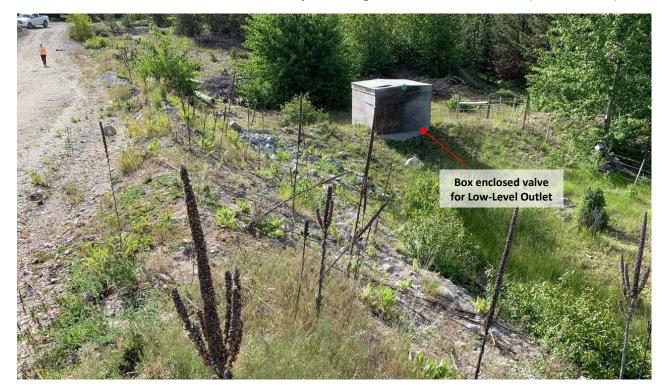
Overview of the pond and low-level outlet to Witches Brook via Lower Trojan Dam with view of Trojan Dam downstream slope (TRJ-2019-20)
